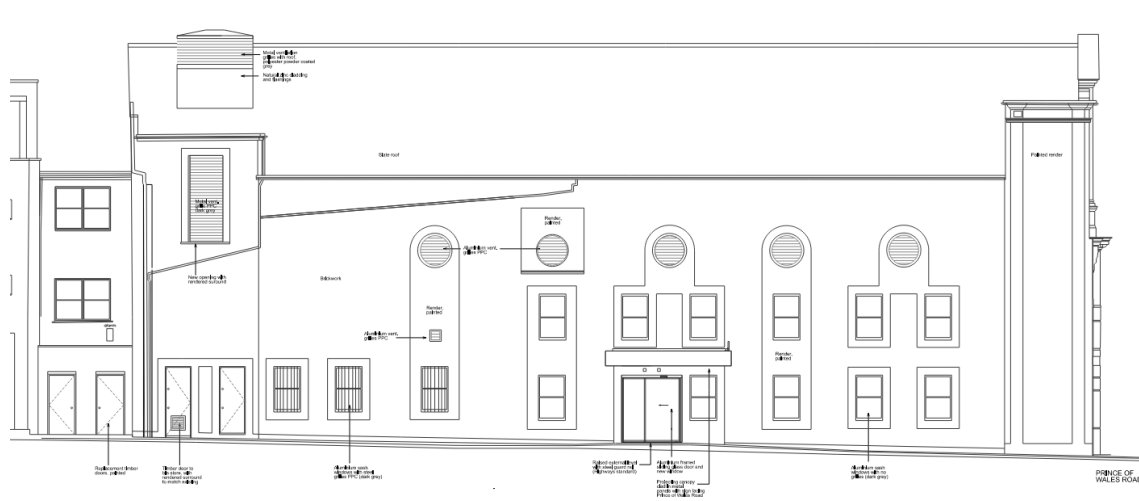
Elevation view of proposed chiller exhaust turrets and intake vent – view west to east
